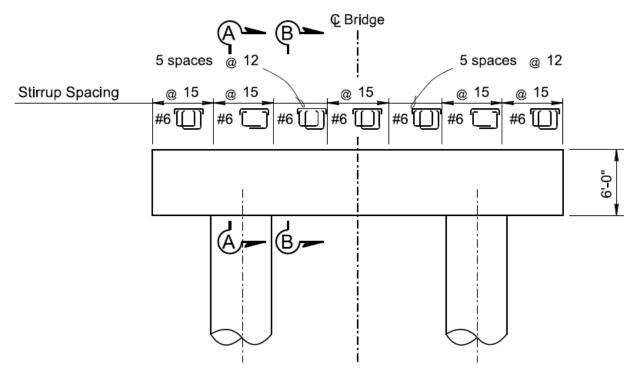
Elevation of Drop Cap Showing Stirrup Spacing
